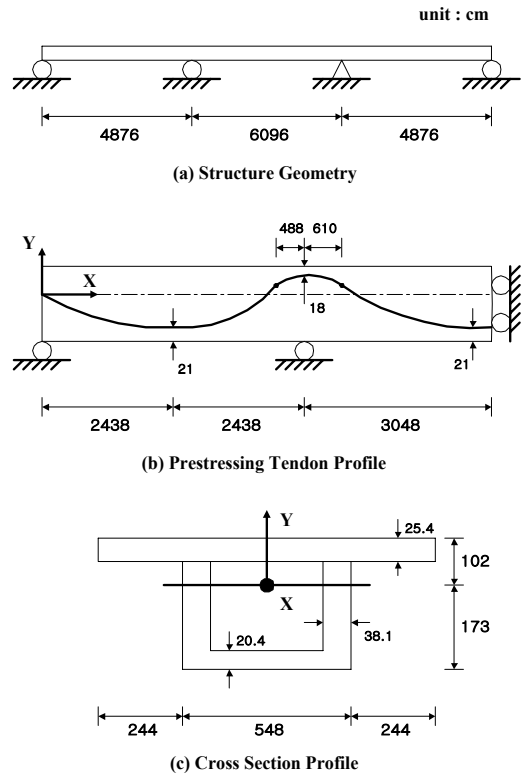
Three span post-tensioned box girder bridge (Choudhury bridge)⁸⁾
